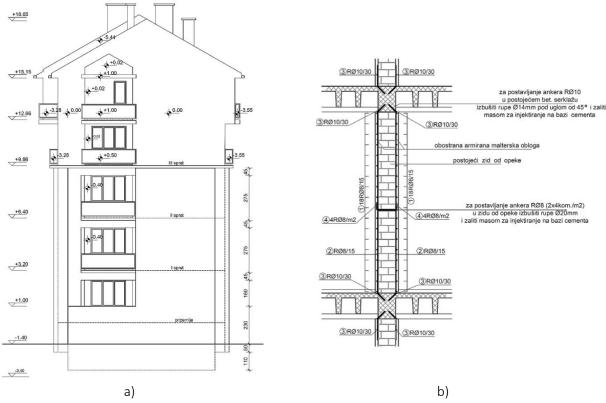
Seismic rehabilitation of a masonry building damaged in the 2010 Kraljevo earthquake: a) vertical elevation of a gable wall showing corner strengthening at the lower 3 floors, and b) two-sided RC jacketing of interior walls (Ostojić, Muravljov, and Stevanović, 2011).
